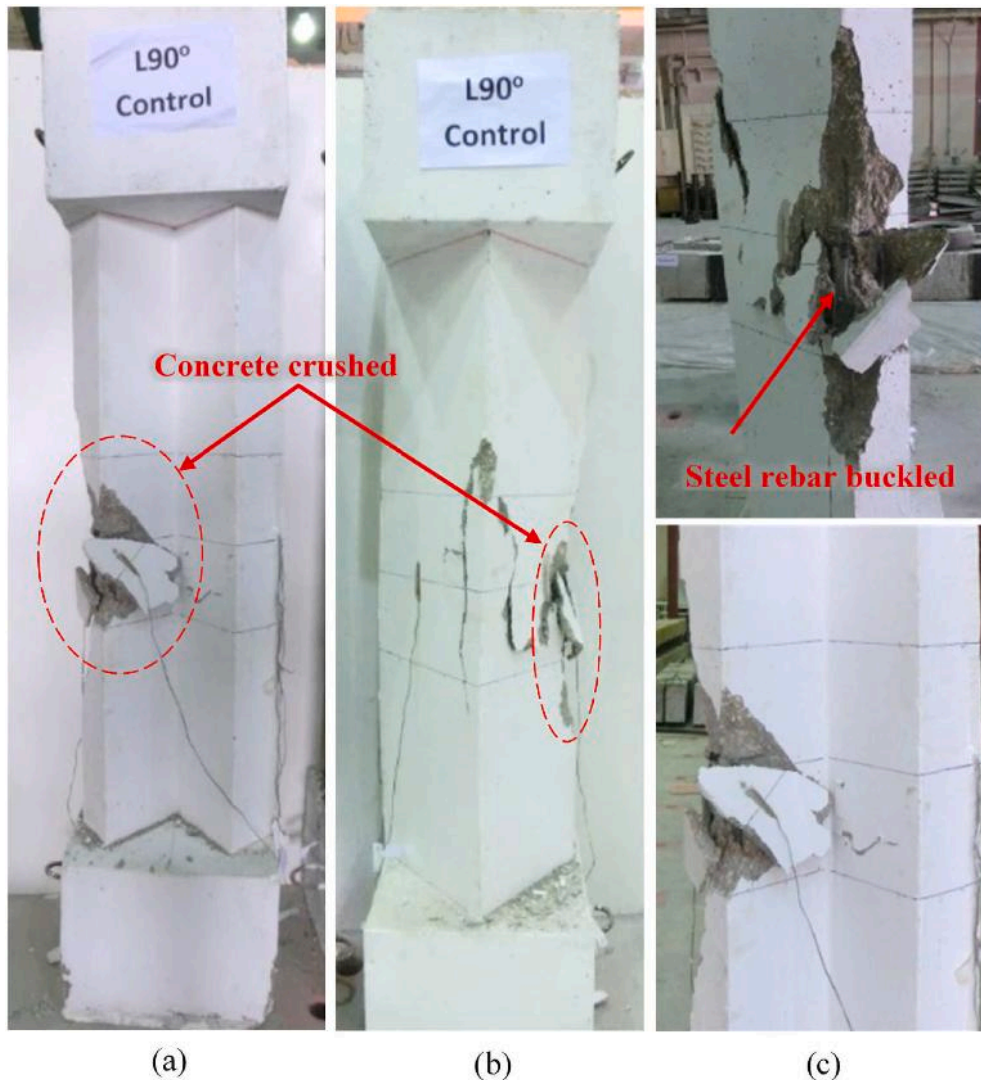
Failure of unstrengthened L90 column: (a) Elevation view; (b) Rear view; (c) Close view.
